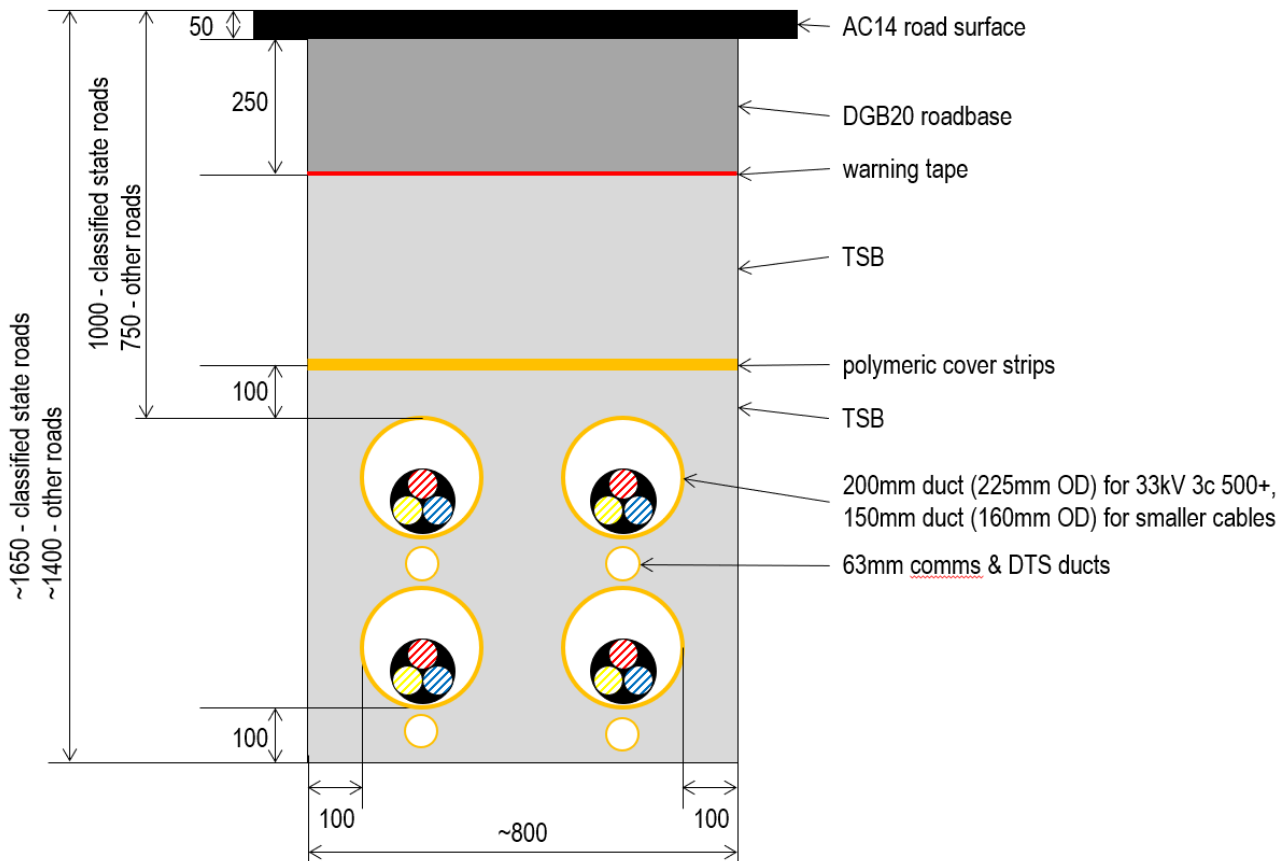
Typical trench cross section - four circuit 33kV three core cables
